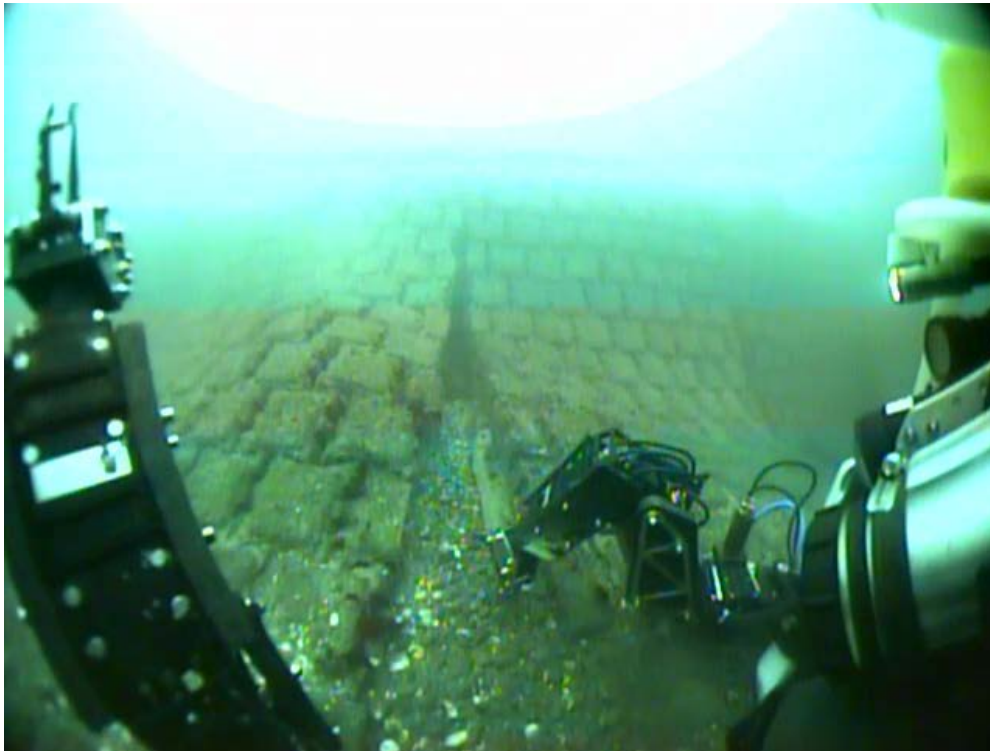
North side of pipe, 1.5 ft gap in concrete mats (ROV arm for scale)
